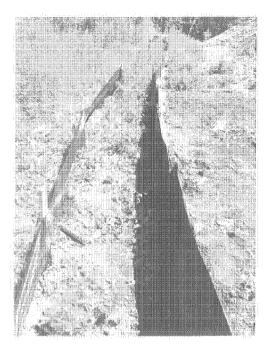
Complete D9 Area (Northwest) – Completed D9 Excavation. Note PIM slope material from 20⁷ – 25' BGS layer staged in the excavation as backfill (8/20/2010).
